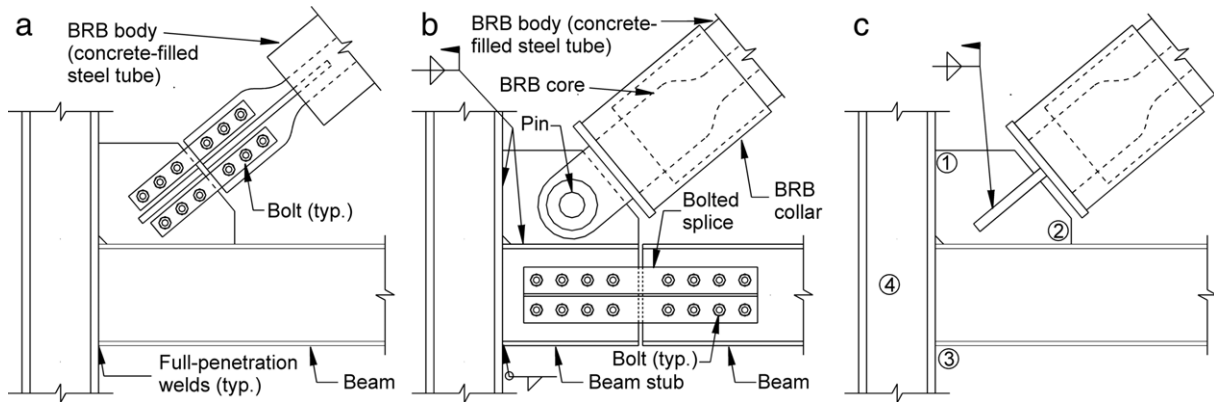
BRBF connection details: (a) continuous beam, bolted brace; (b) spliced beam, pinned brace; (c) continuous beam, welded brace.
